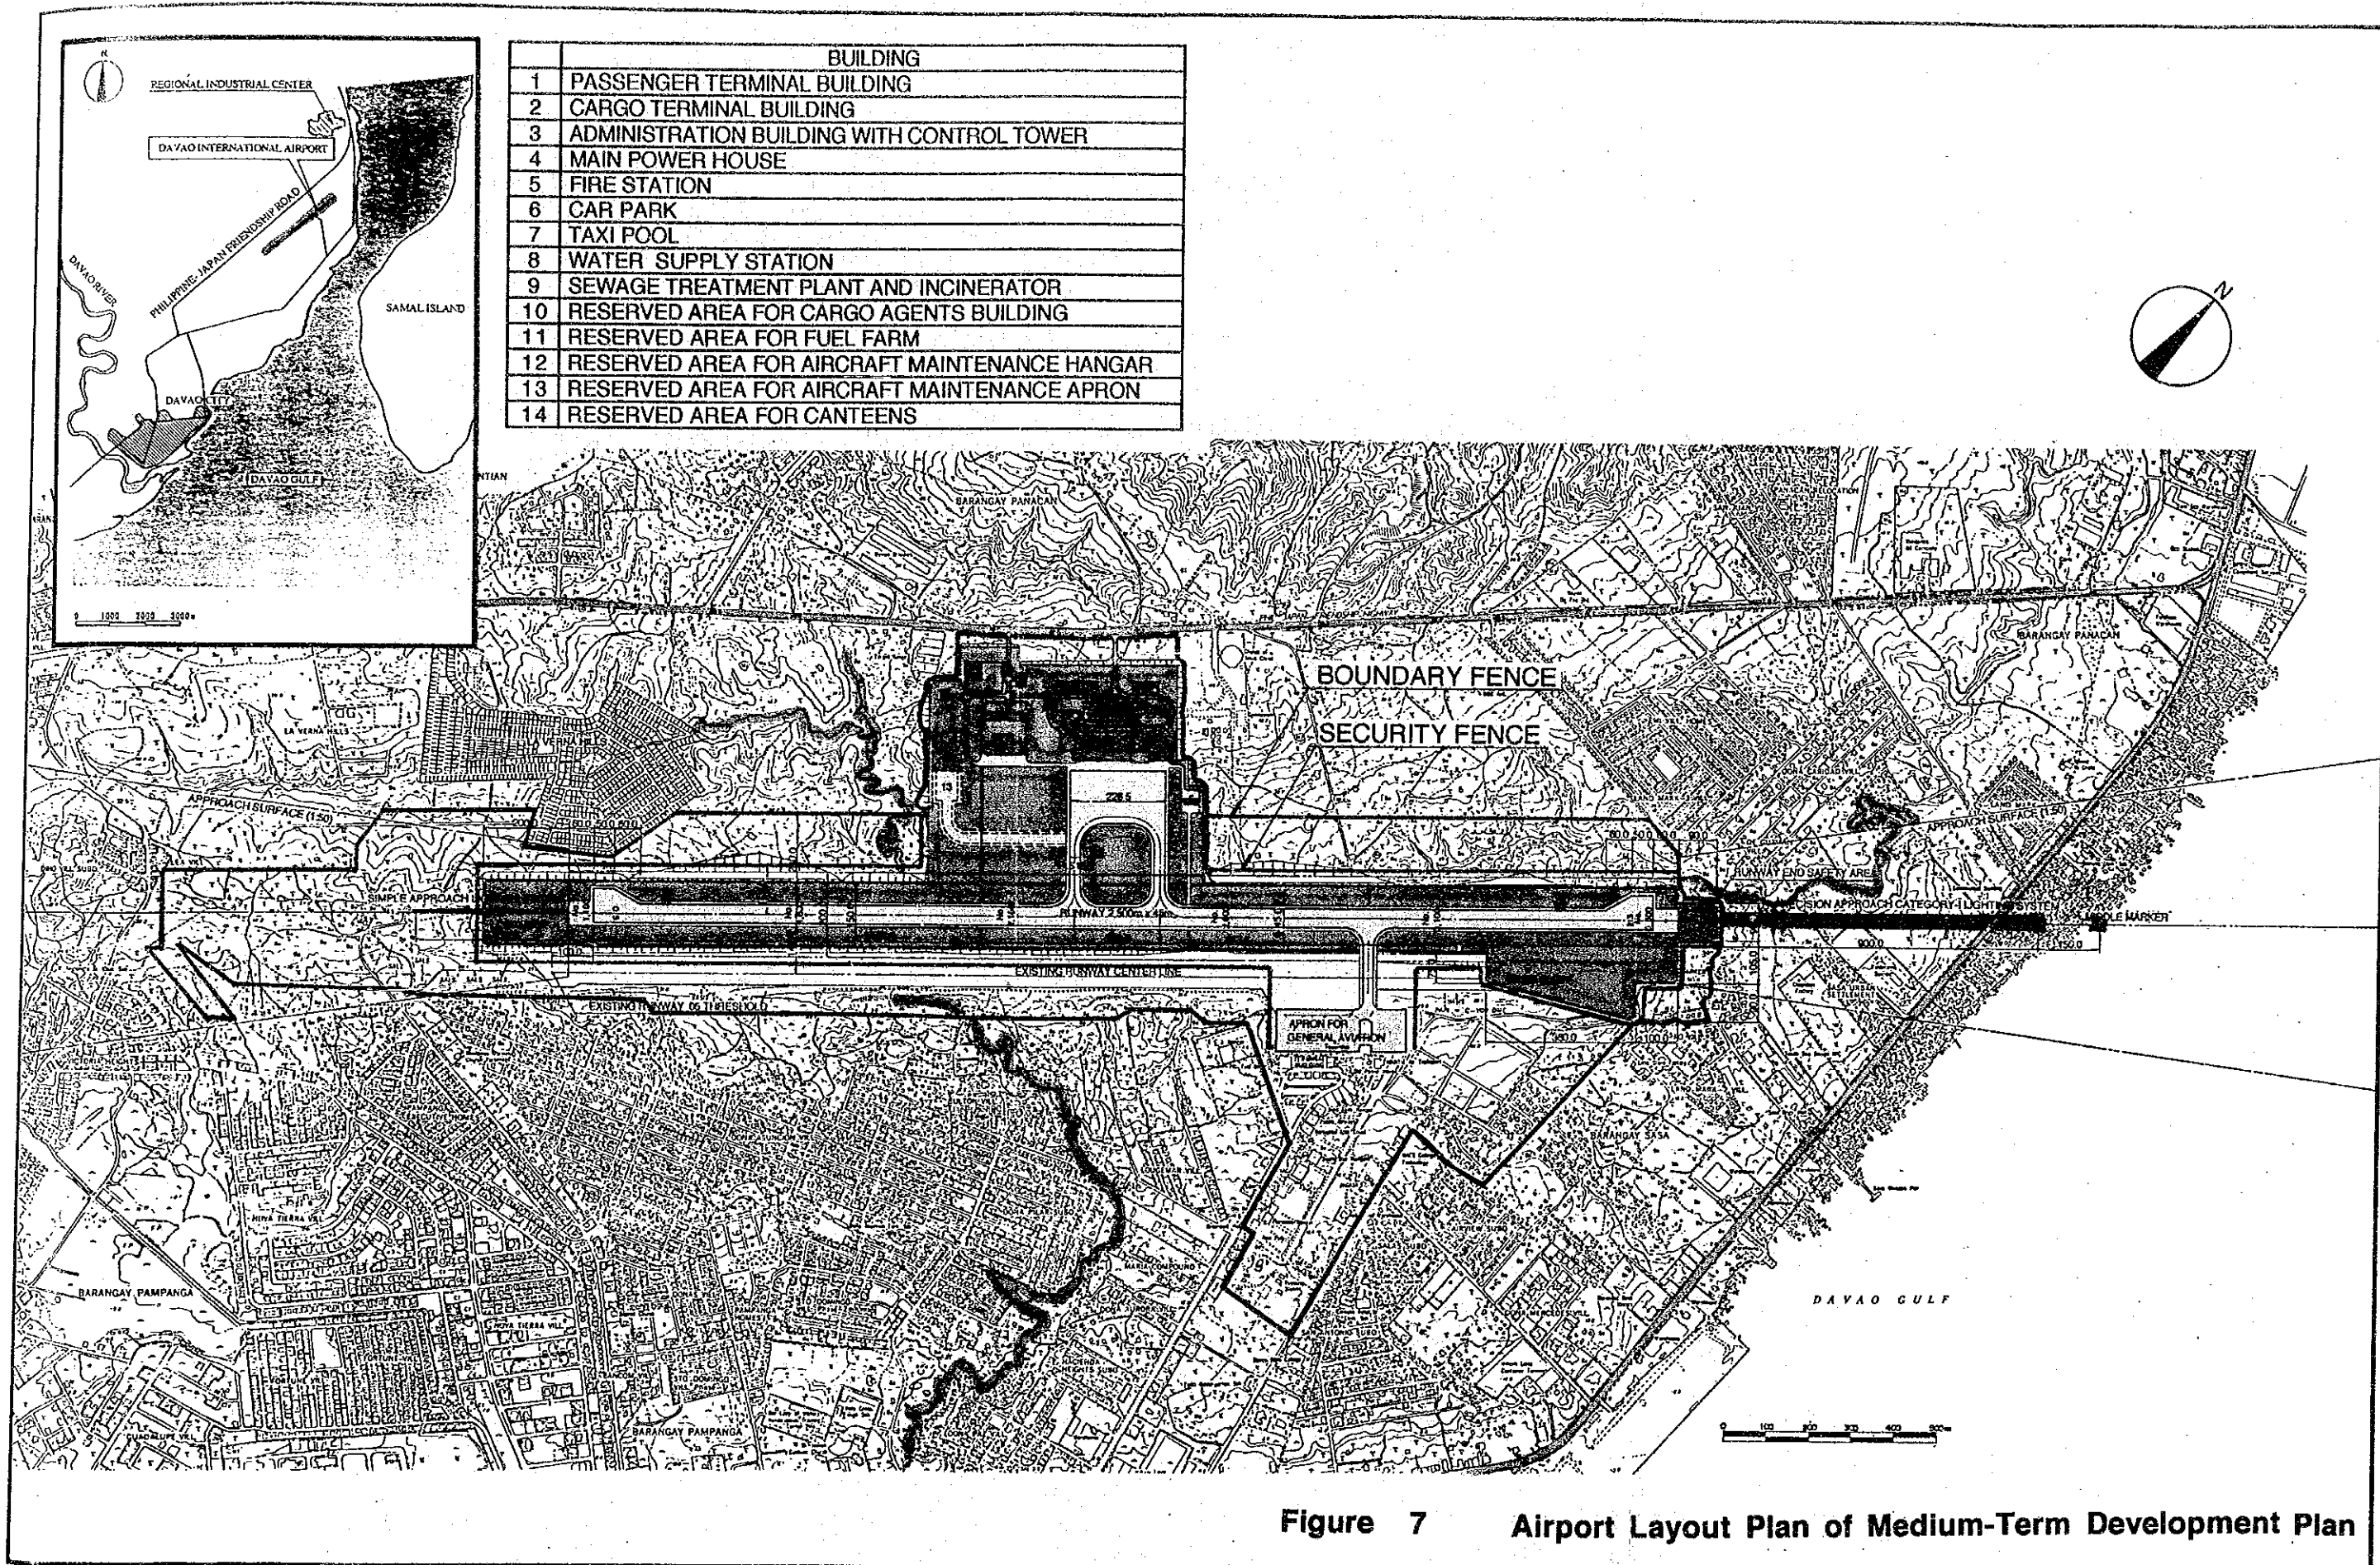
Airport Layout Plan of Medium-Term Development Plan
